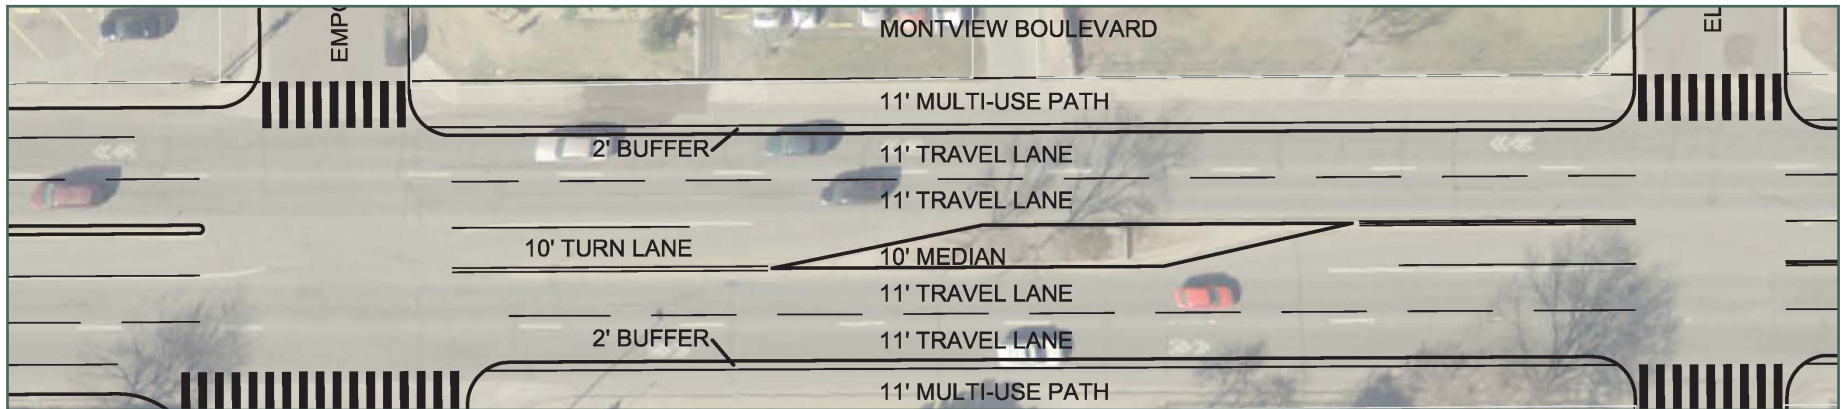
West Residential Zone Mixed Bike and Pedestrian - Plan
